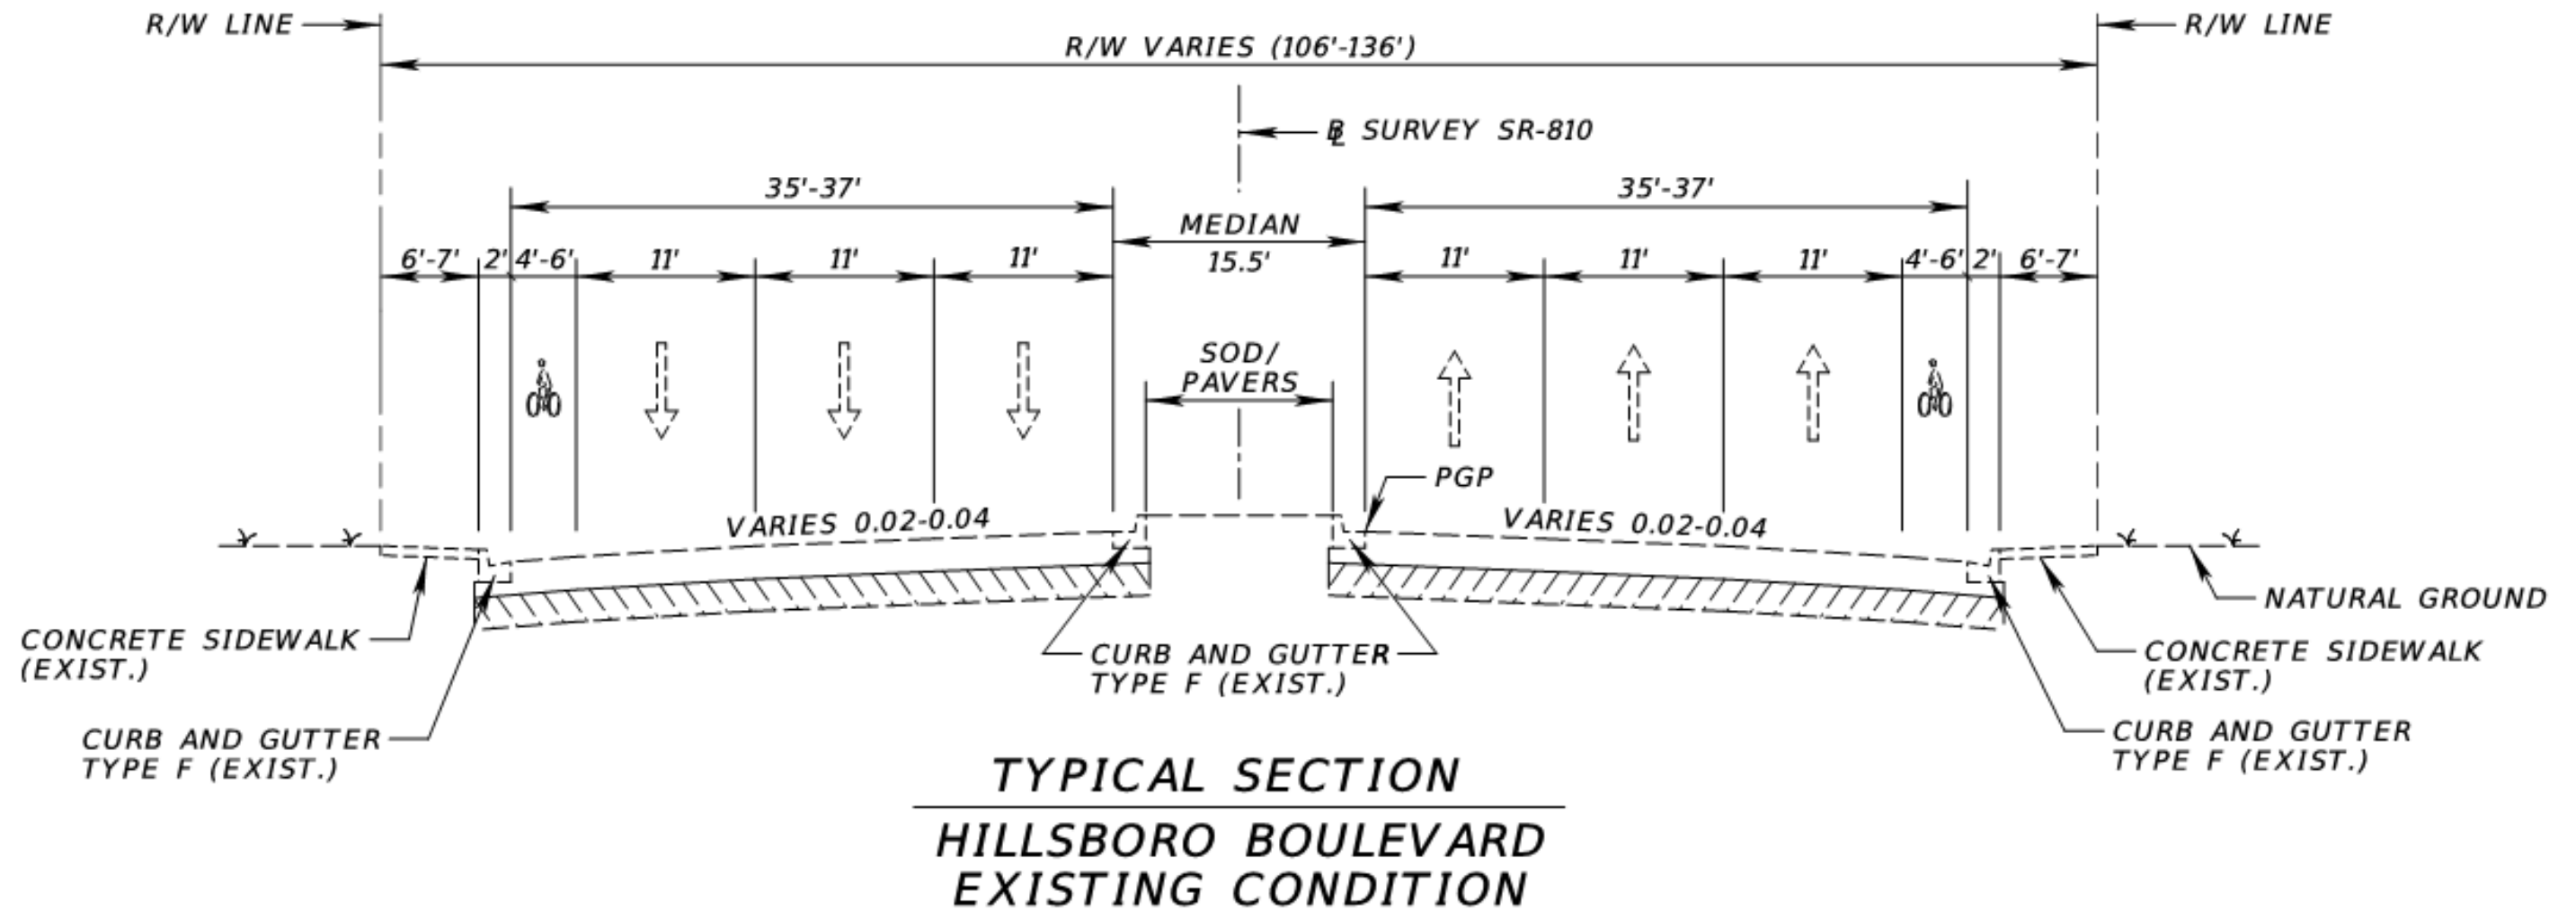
6: Existing Typical Section - Hillsboro Boulevard
